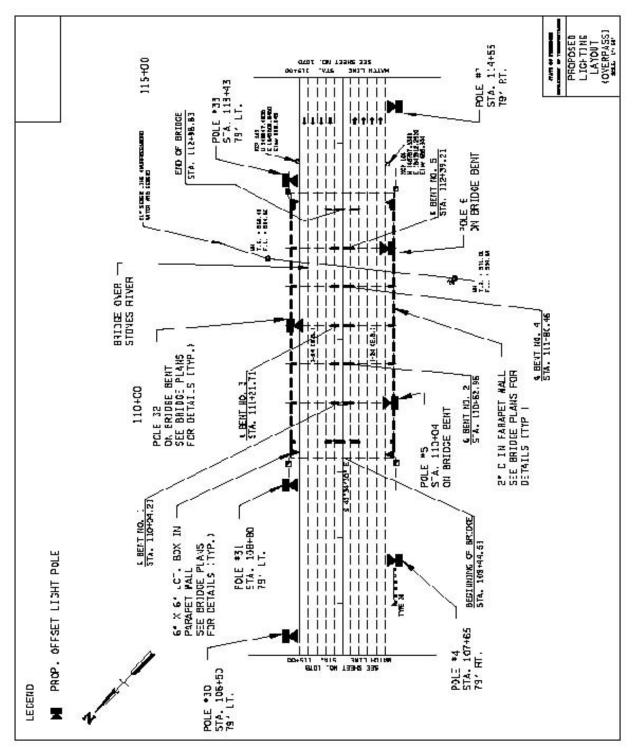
Detail of Proposed Lighting Layout at Bridge Overpass (NTS)
